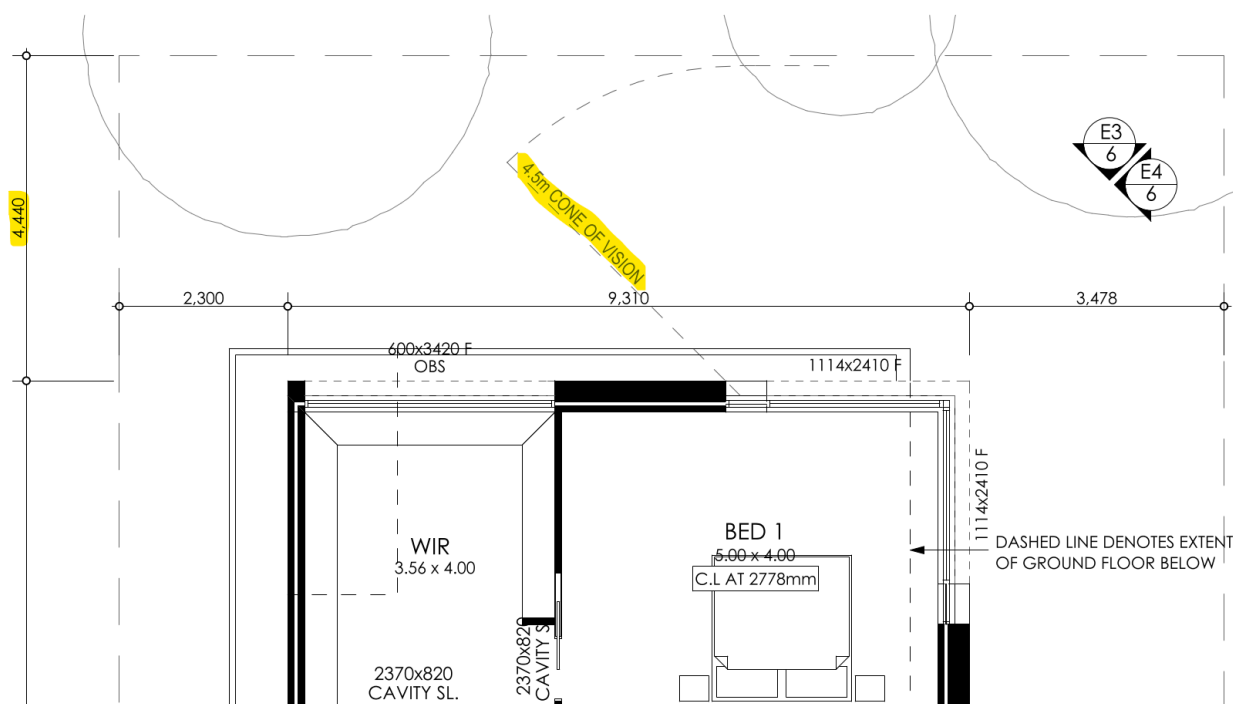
Updated upper floor plan with the correct lot boundary location.
